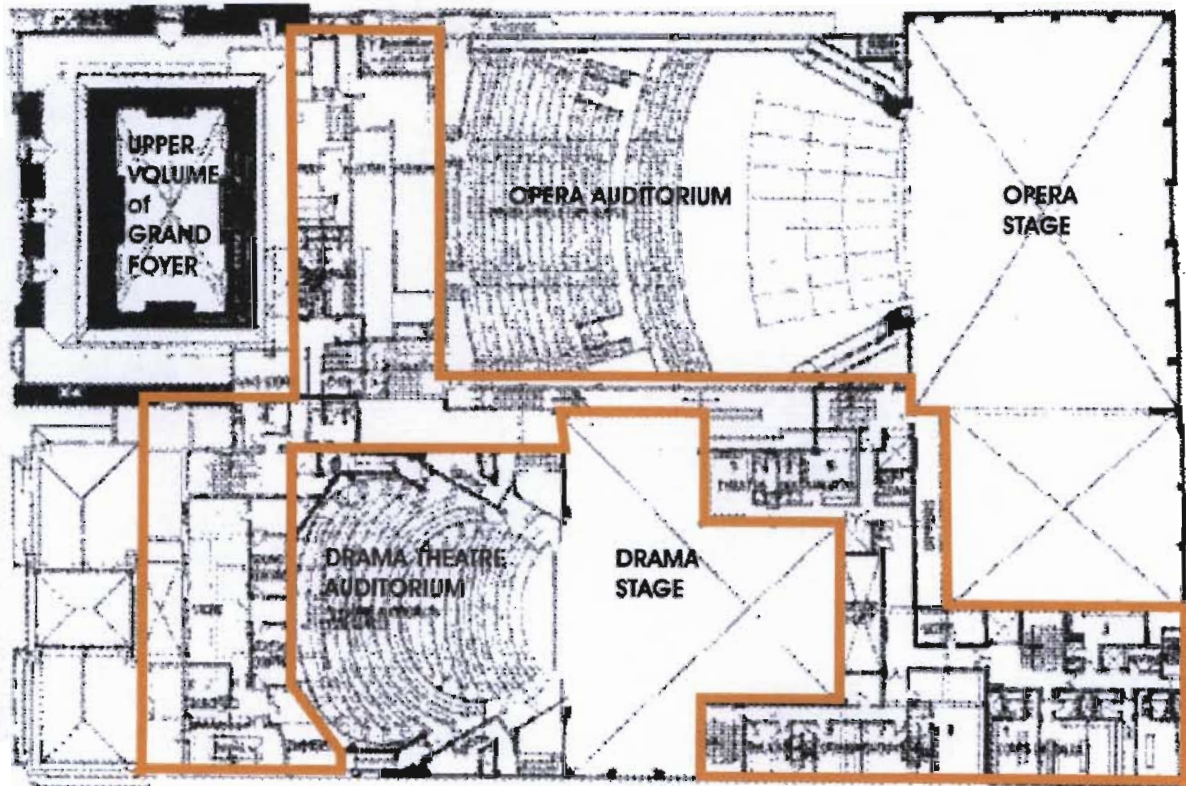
Playhouse First Floor Plan (Peters, 1983)
